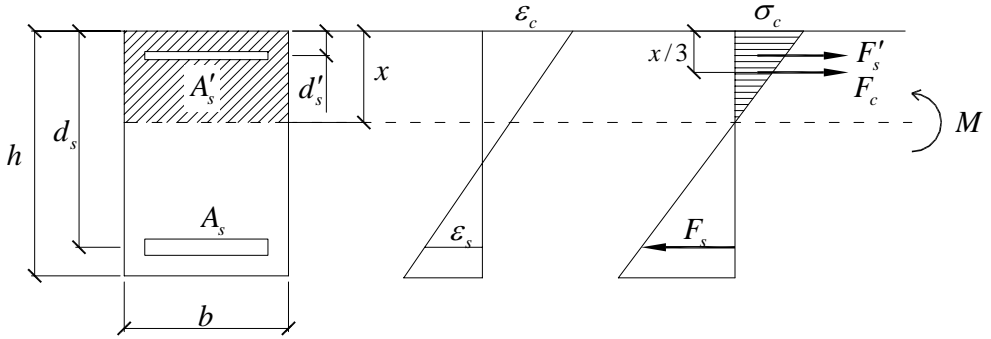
Rectangular concrete cross-section in service limit state (SLS) and stage II.
